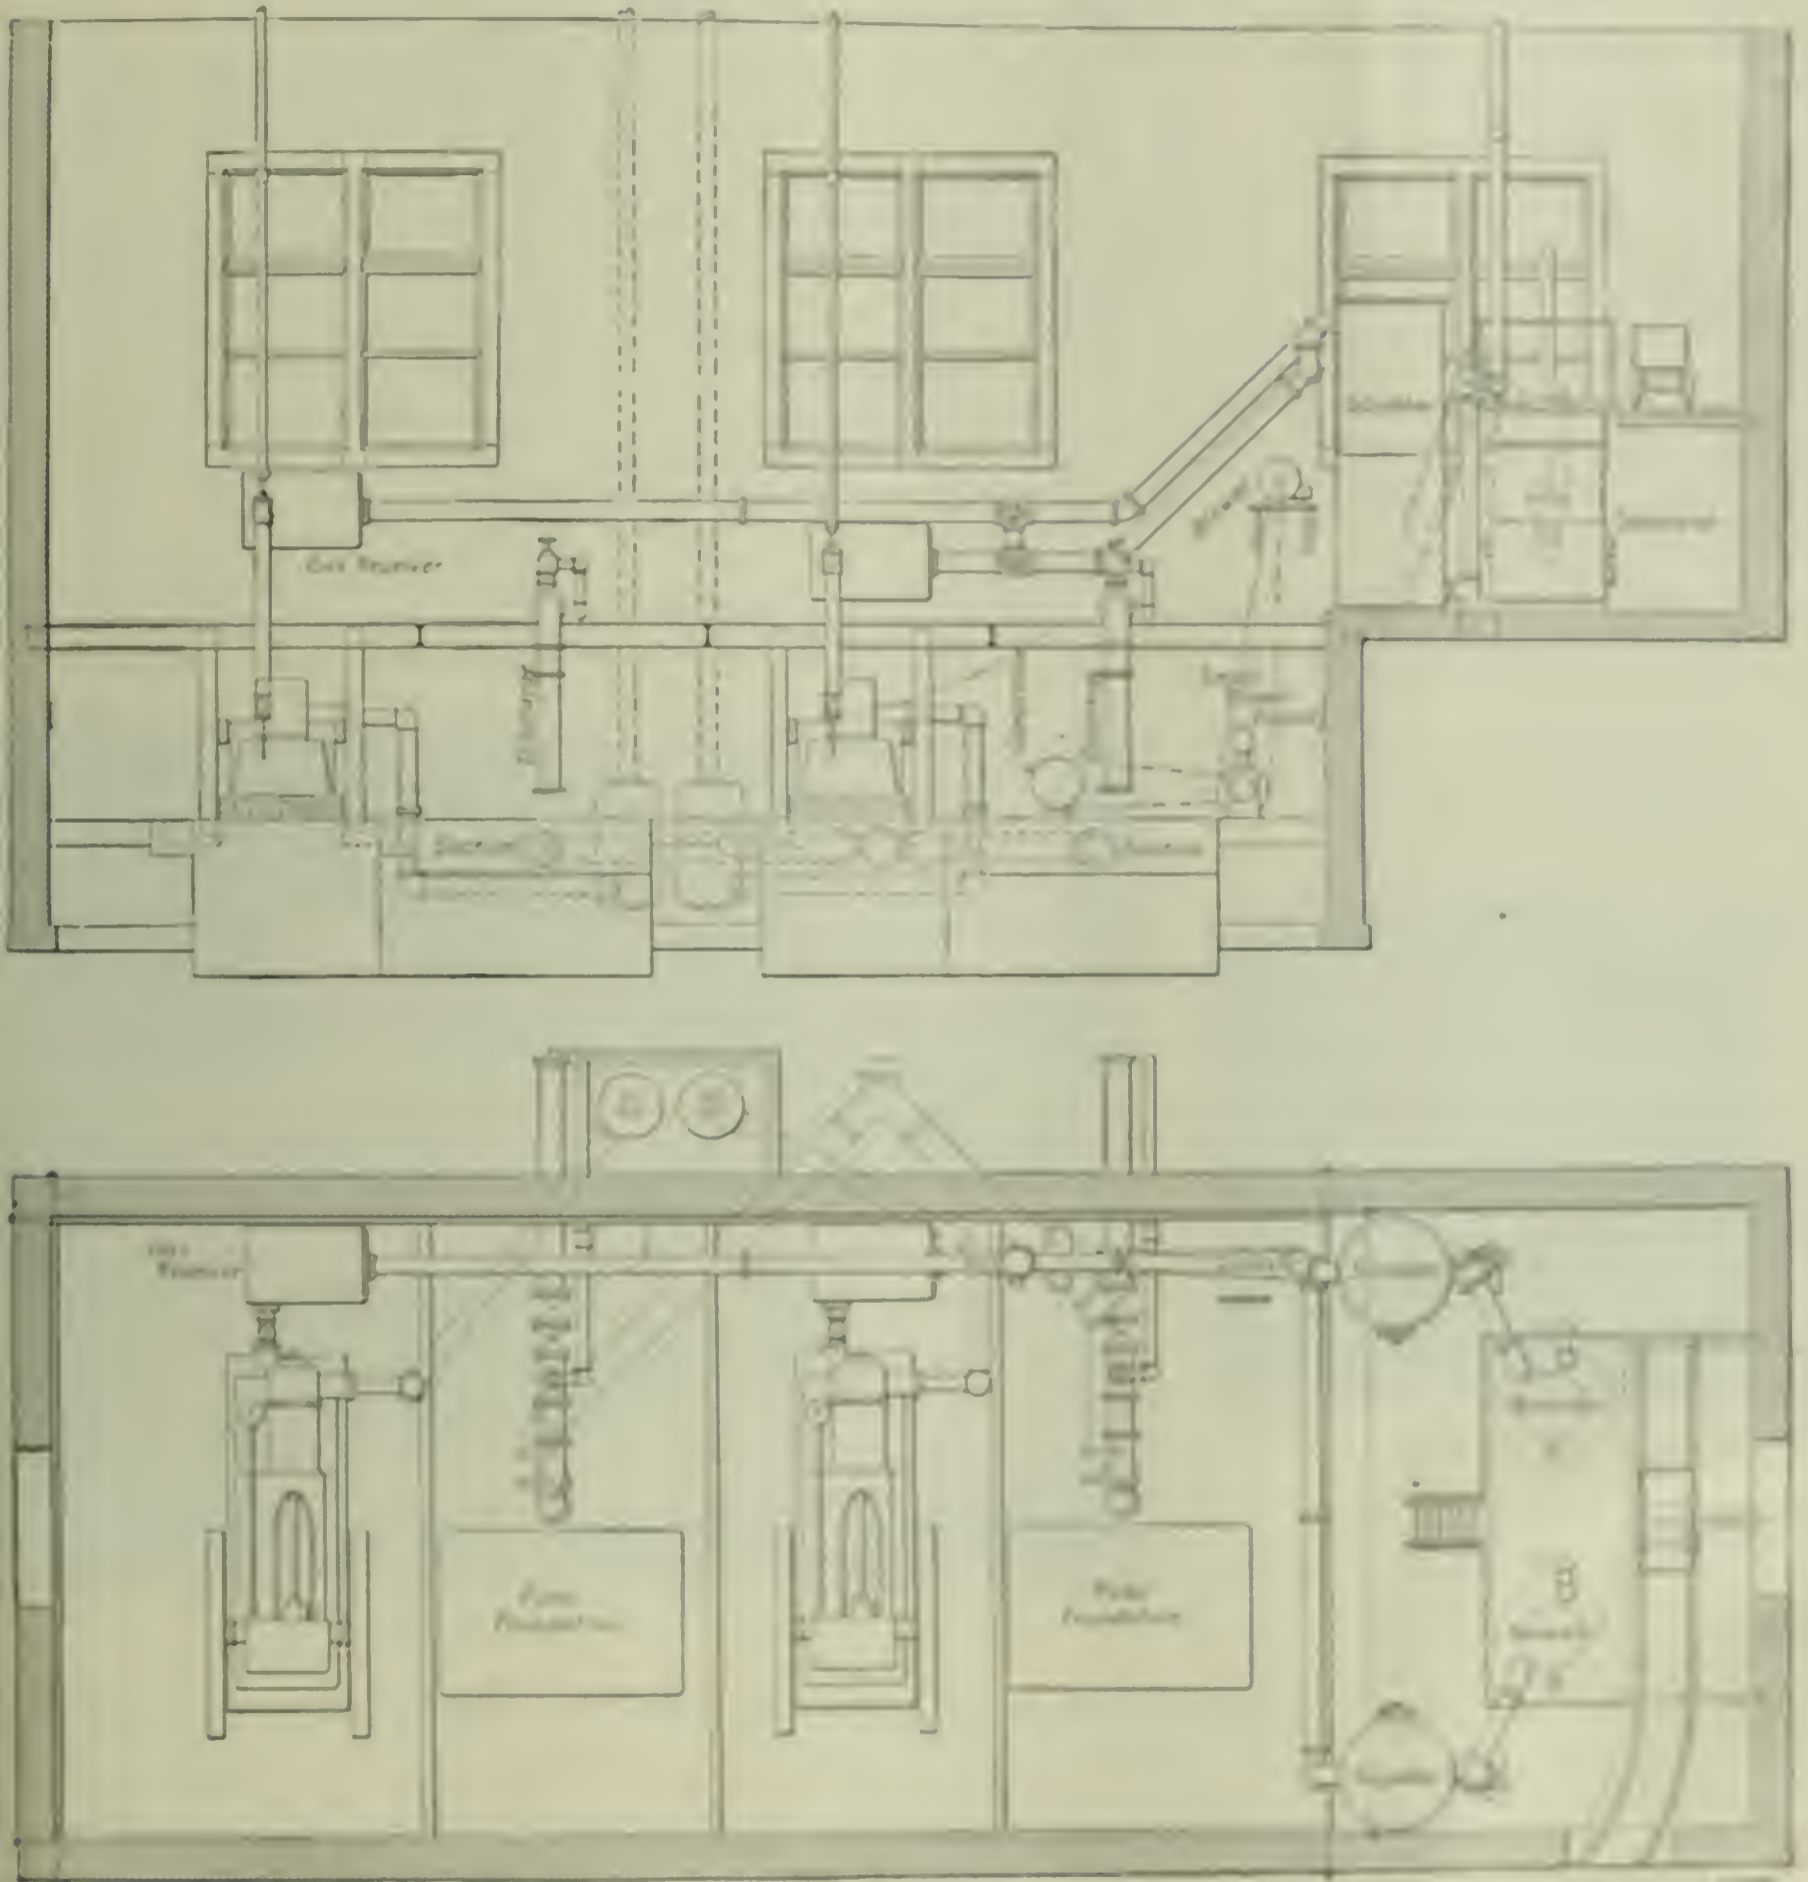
ELEVATION AND PLAN VIEW OF APPARATUS IN HANCOCKFIELD GAS-POWER PLANT
